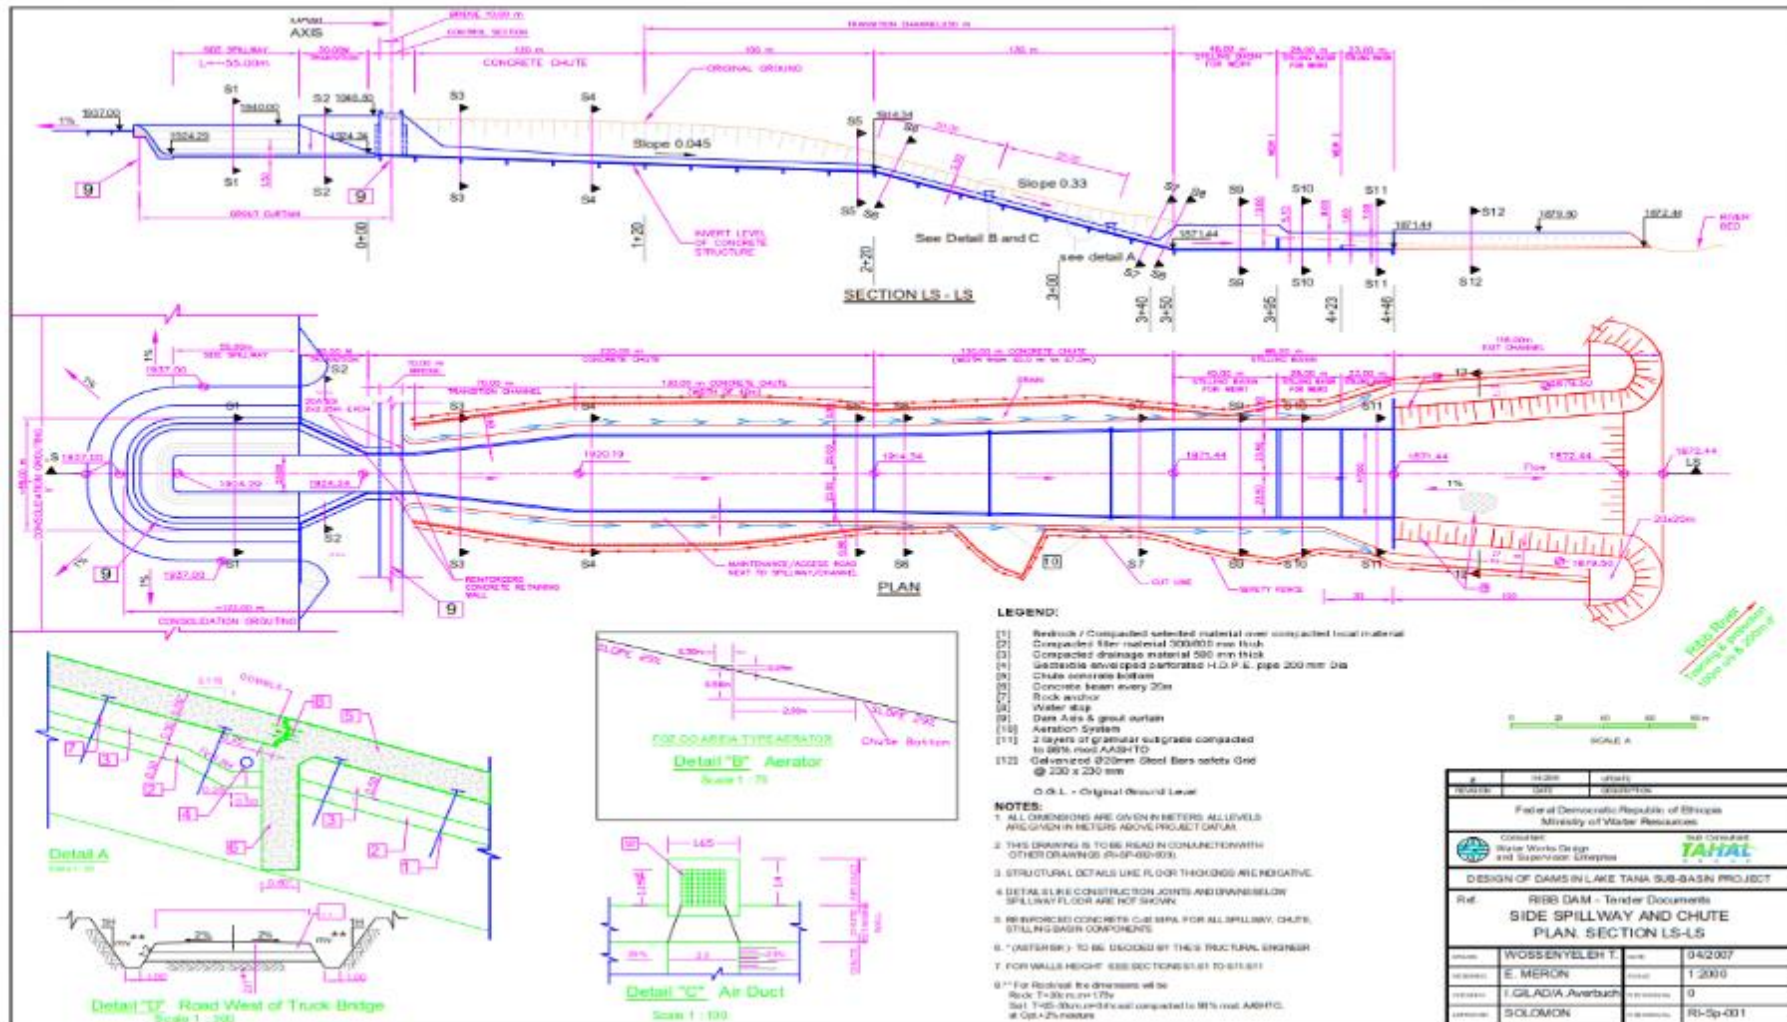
1 Plan and Section of the Spillway as per the Design [73]
